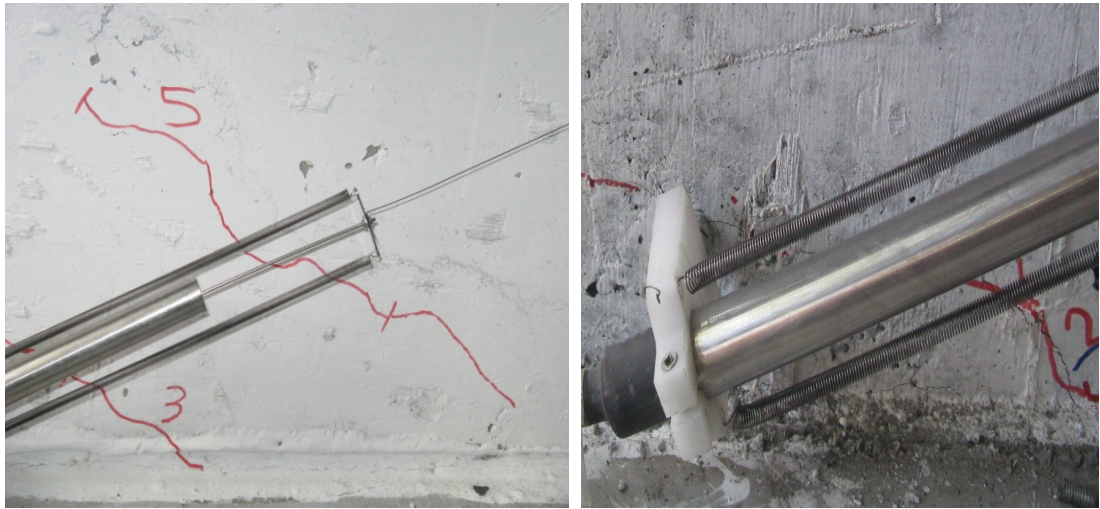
LVDT Spring-Loading and Mounting Assembly.
